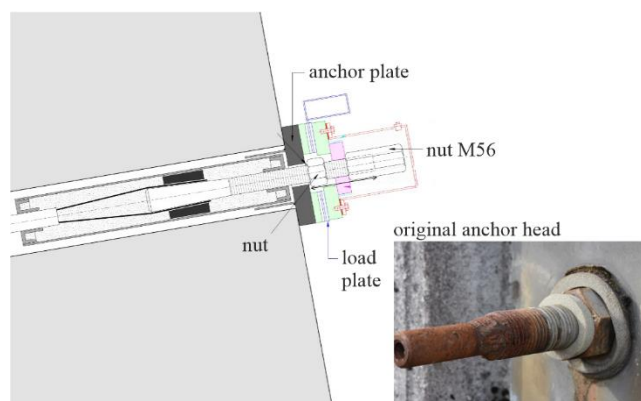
Example of retrofitting an anchor load plate for tensile elements or anchor heads with threaded component.
